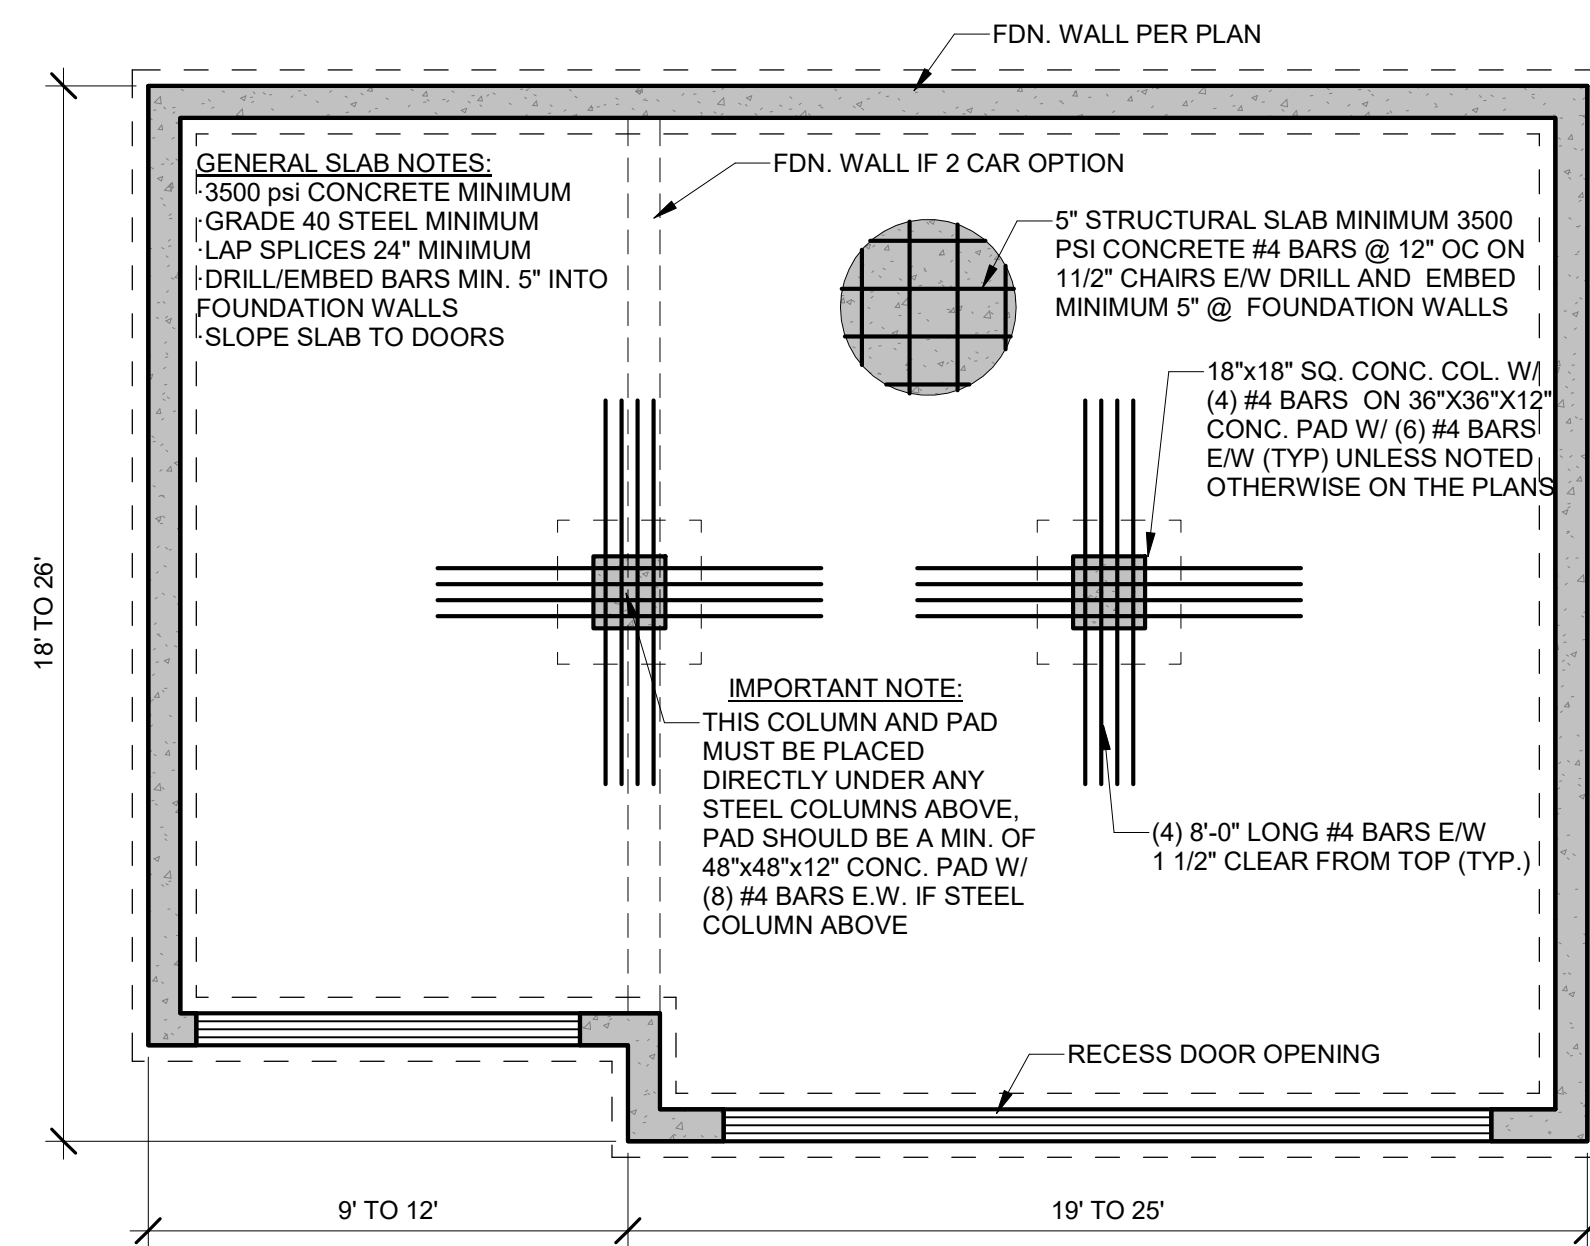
DETAILS PROVIDED ARE DERIVED FROM JOHNSON COUNTY RESIDENTIAL FOUNDATION GUIDELINE
